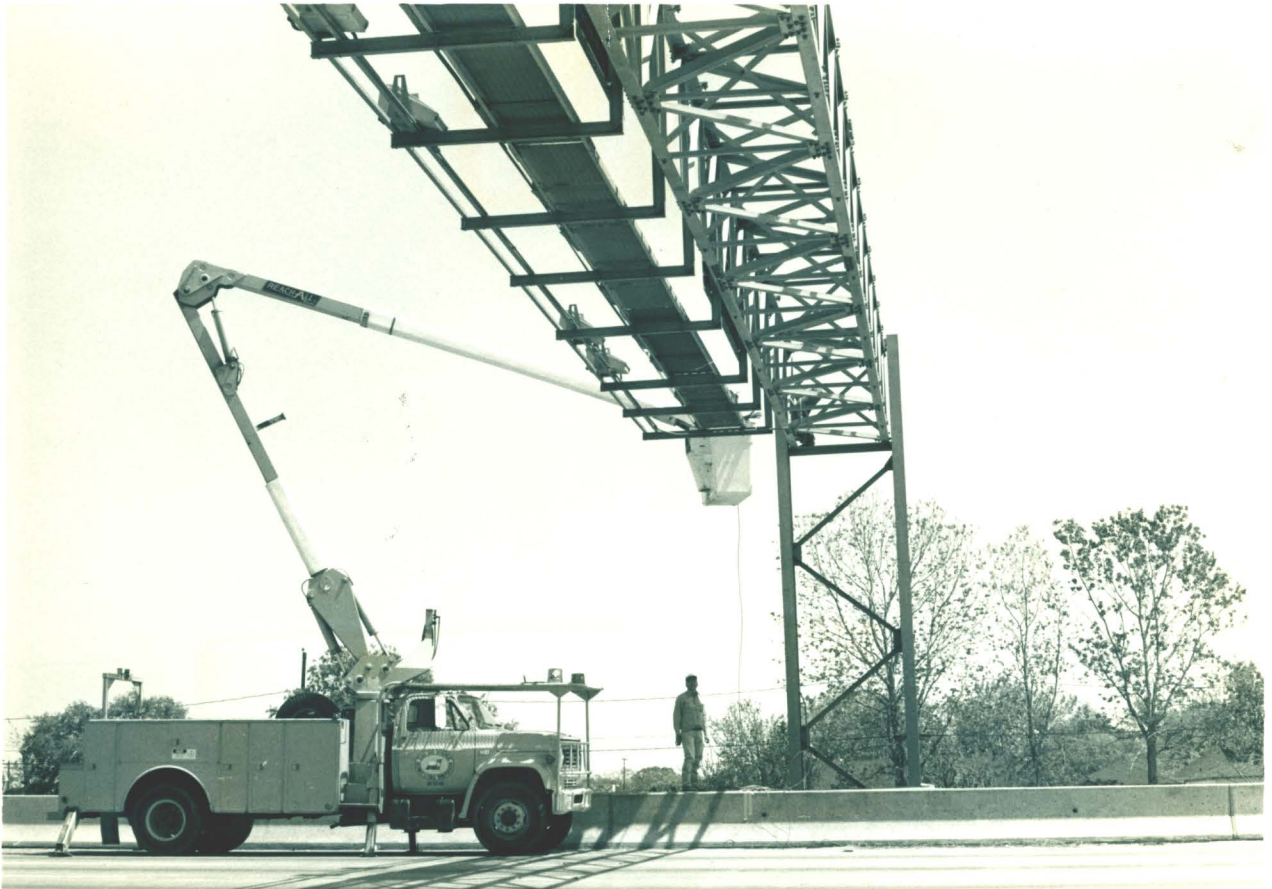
Stringing Cables on the Overhead Sign Structure
